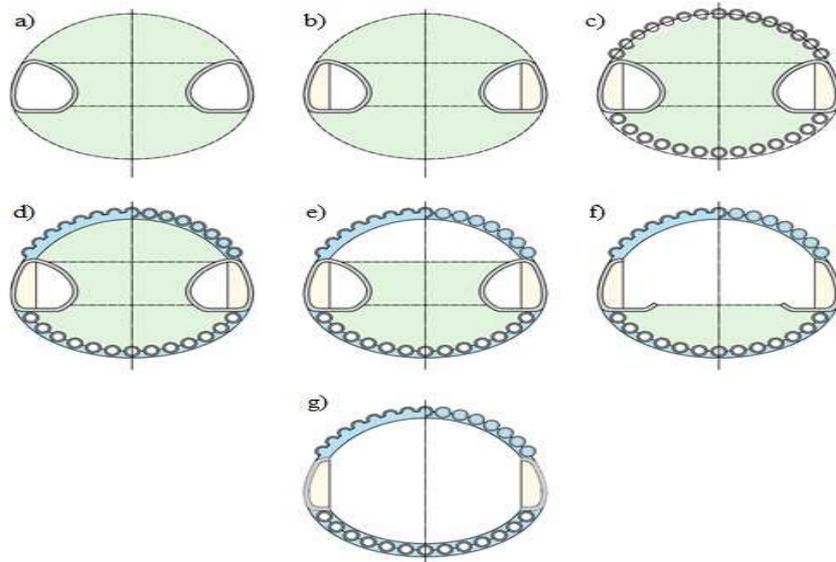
Scheme of the Construction Sequence of a Subway Station based on a Low-Subsidence Technology in the Internal Dimensions of the Subway Station "Sportivnaya": a) Construction of Supporting Tunnels; b) Construction of Reinforced Concrete Support Elements in the Supporting Tunnels; c) Construction of a Screen of Pipes in the Arch and in the Reverse Arch of the Station; d) Construction of Bearing Arches in the Arch and Inverse Arch along the Length of the Station; e-g) Soil excavation in the station Section, Partial Dismantling of the Concrete Liner and Alignment of the Internal Contour at the Level of the Reverse Arch [10].
